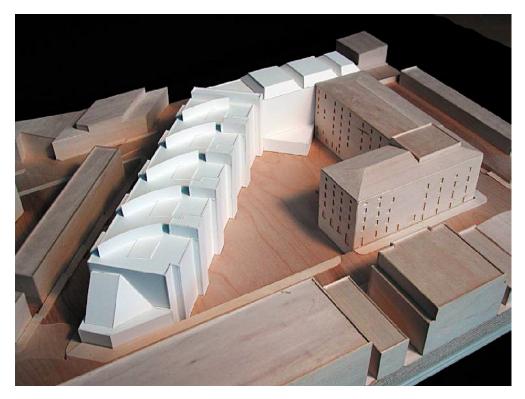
A rendering of the existing 'Old Distillery' building (dark) and the projected new residential building (light).
